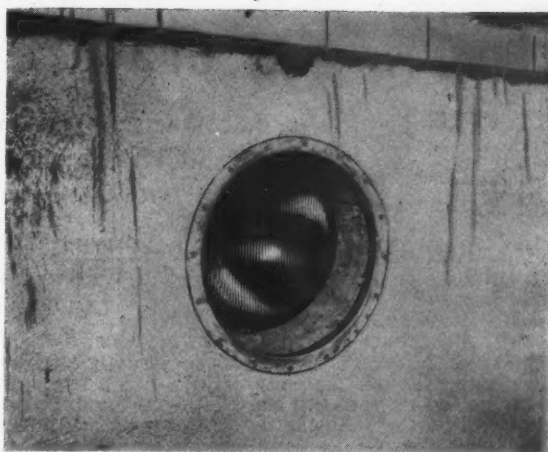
One of the special underwater floodlight projectors installed in the Swimming Pool. The lighting units are housed behind watertight portholes just below water level.
